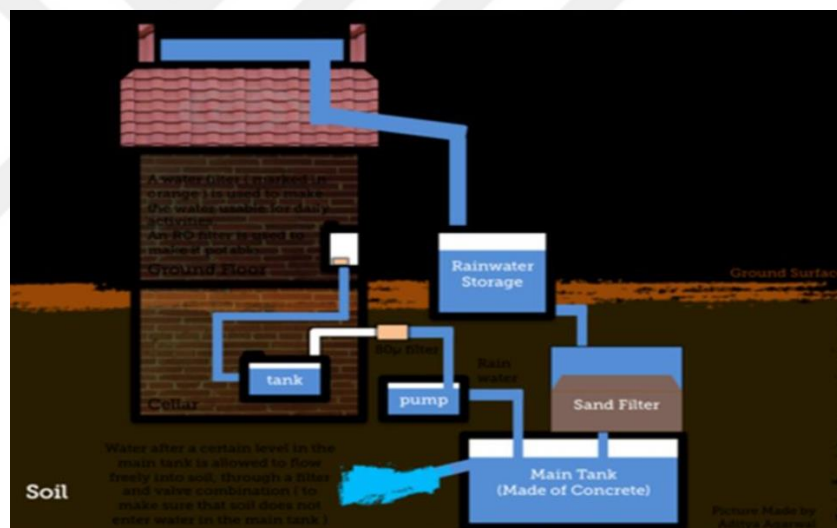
Water collecting from the roof surface (Anonymous 7, 2023).
